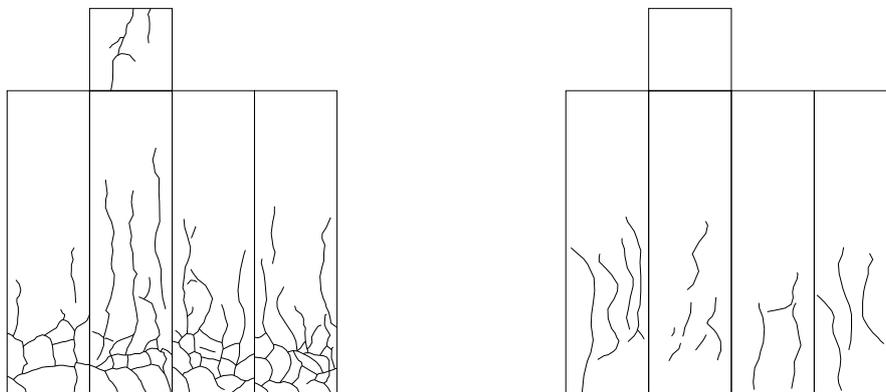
Cracking developed in pile 11 at two years (left) and in pile 14 at one year (right).
